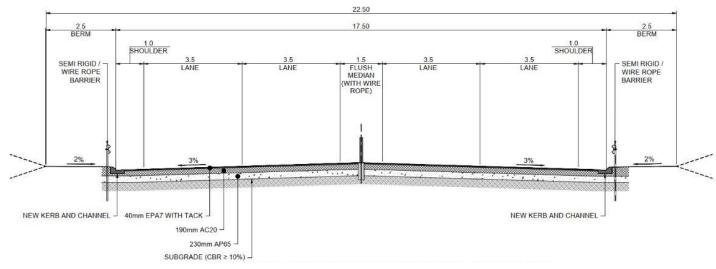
Indicative midblock cross-section (note excludes earthworks and stormwater elements)
